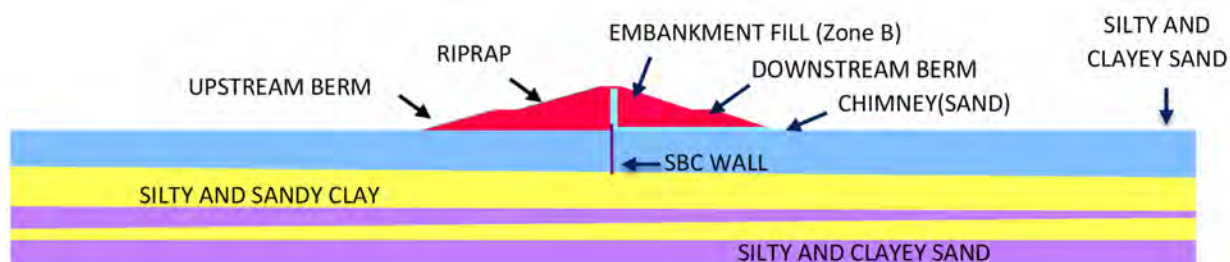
Typical Geometry and Zonation for Alternative 3—Walnut
